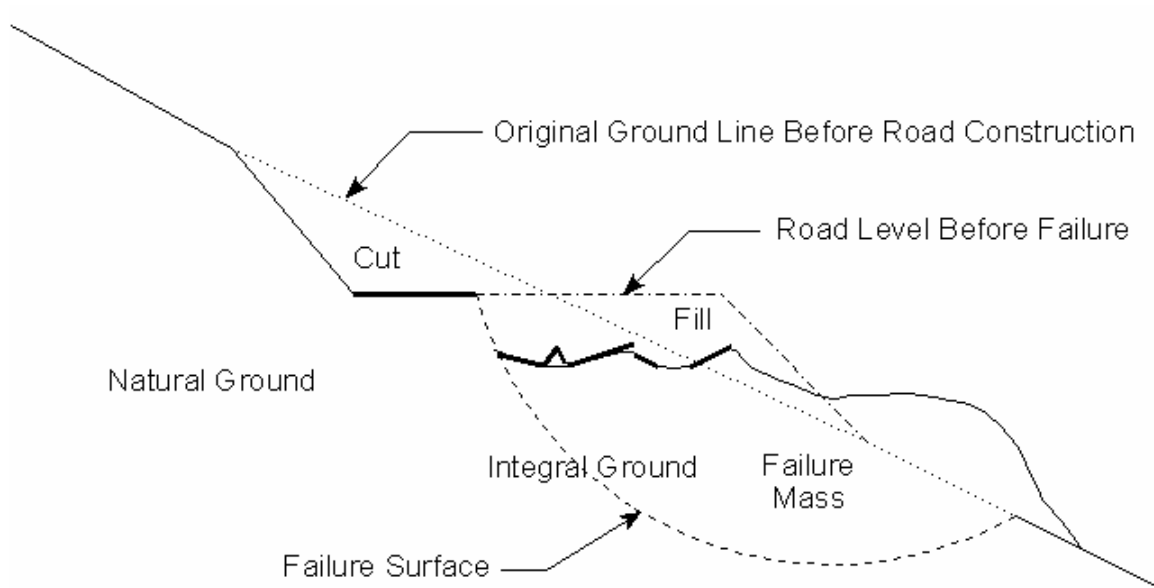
Slope failure in a typical cut-and-fill road section, illustrating the failure mass and the concept of integral ground beneath the facility. Restoration of integral ground in this case would constitute an eligible component of work required to repair the road, and would involve excavation slightly beyond the limits of the failure surface.
